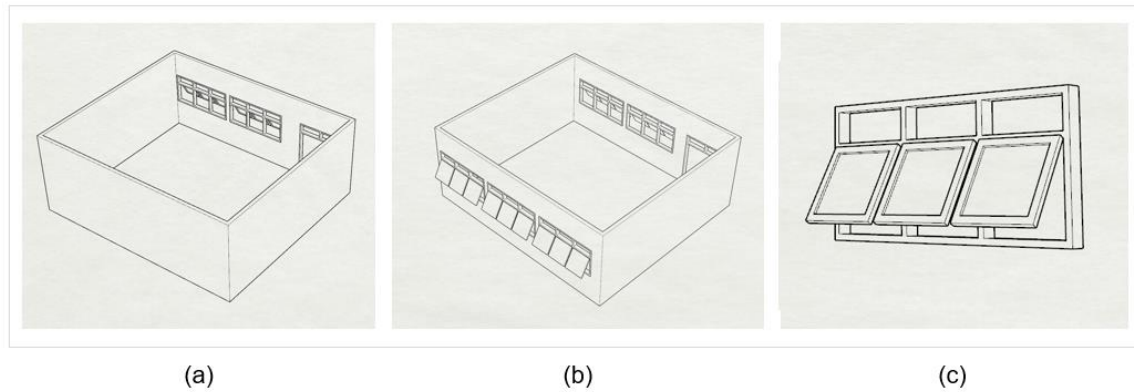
(a) Single-sided ventilated classroom; (b) cross-ventilated classroom; (c) detail of the window opening
